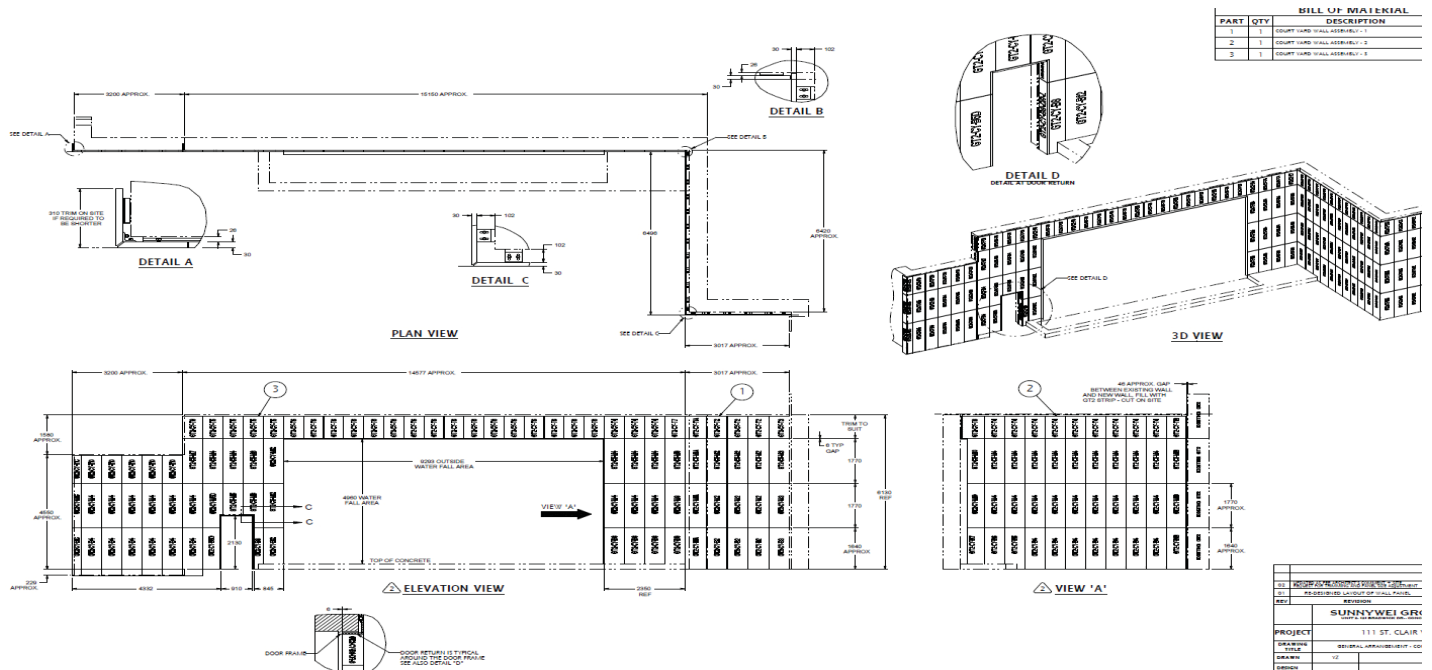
2D & 3D Layout Design of Building Walls (Toronto Imperial Plaza Court Yard Wall)
